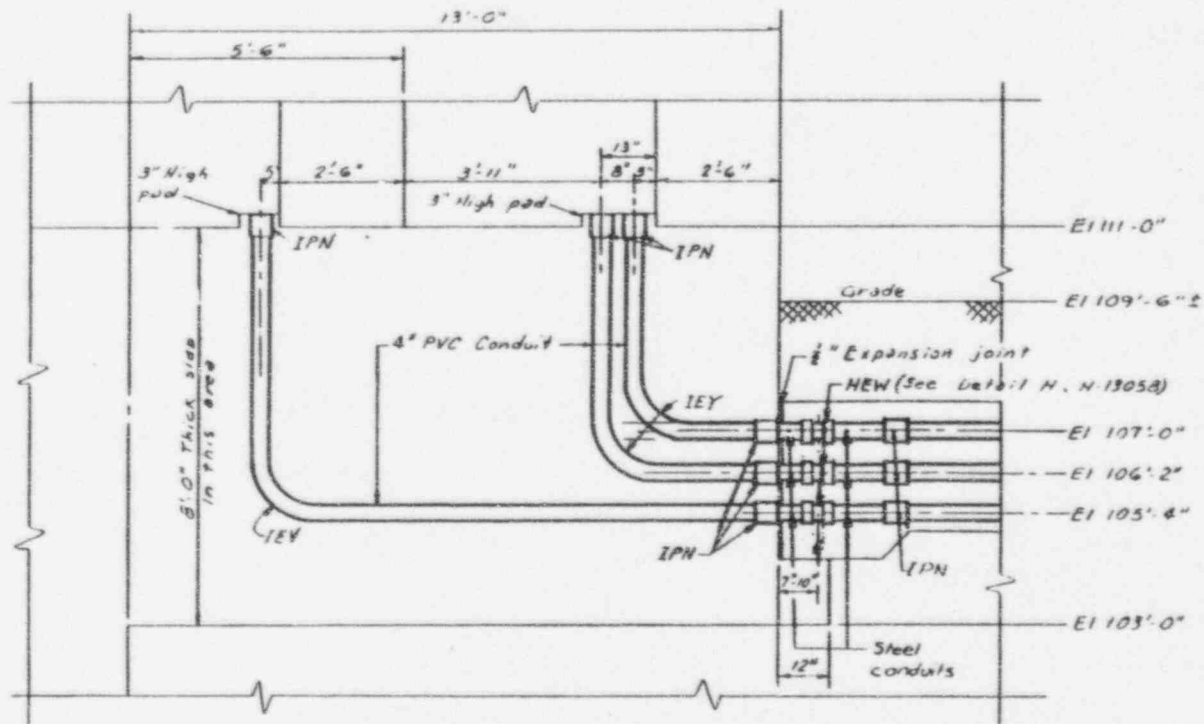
Interface of Buried Conduit Duct Run and Intake Structure
